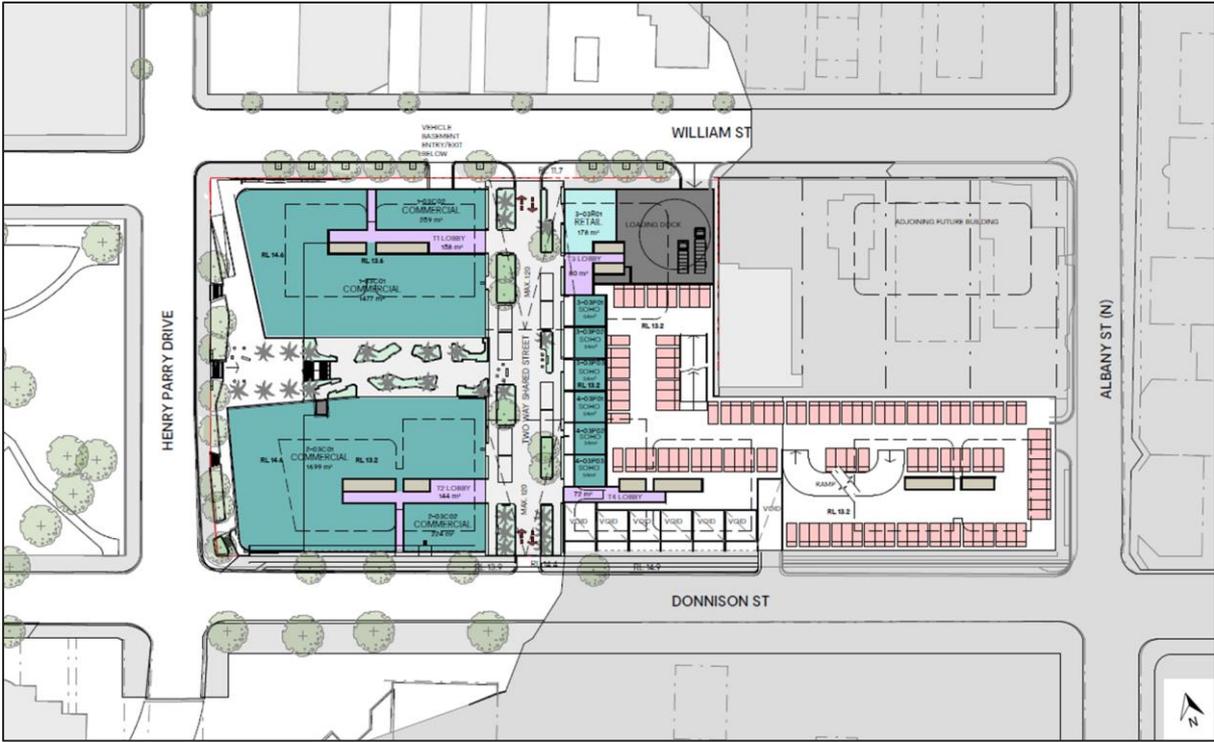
| Indicative ground floor layout (fronting Henry Parry Drive) with through site links and part basement level (fronting Albany Street North) (Source: Applicant's RTs)
